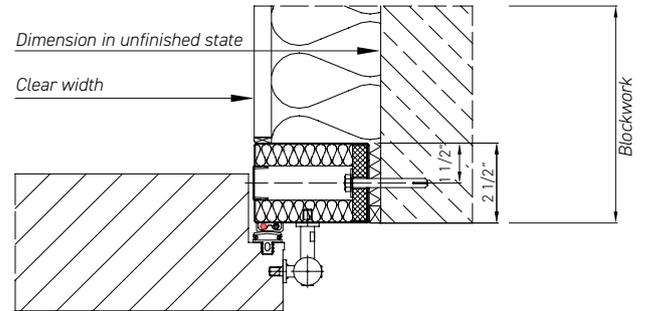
Block / Block frame with pocket holes in the reveal area
